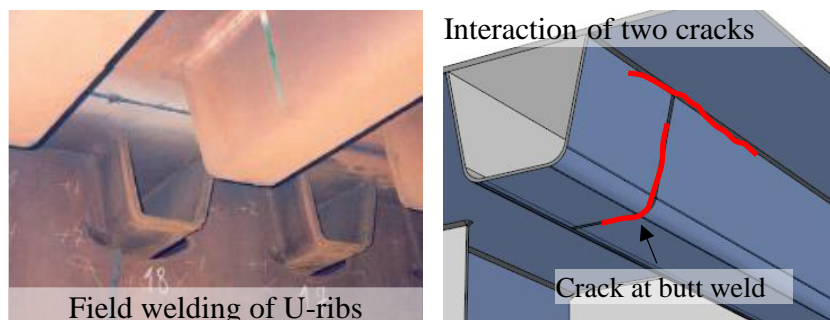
Rib-to-rib cracks at field weld [10]
